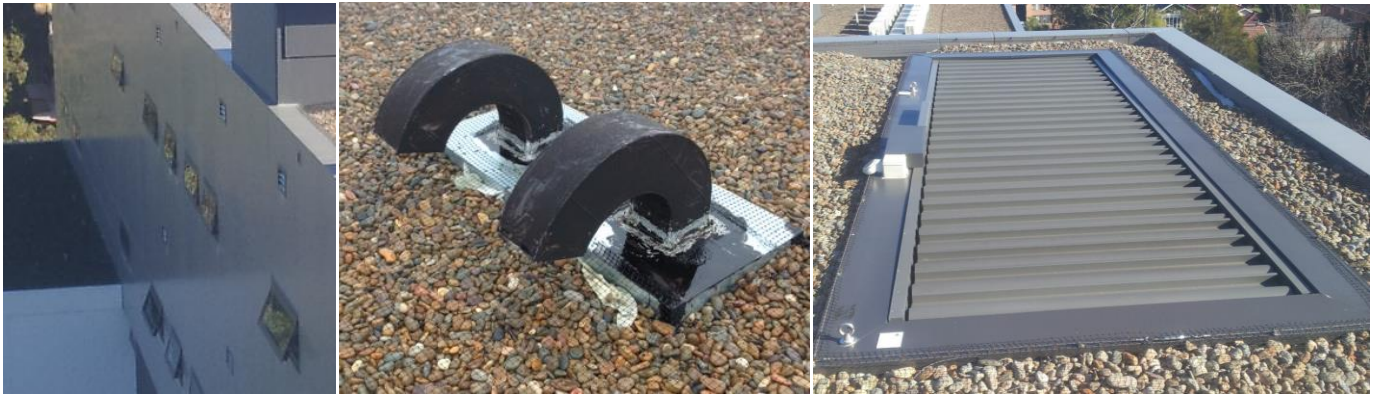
From left to right, apartment vents on external walls, rooftop vents, and rooftop louvers
